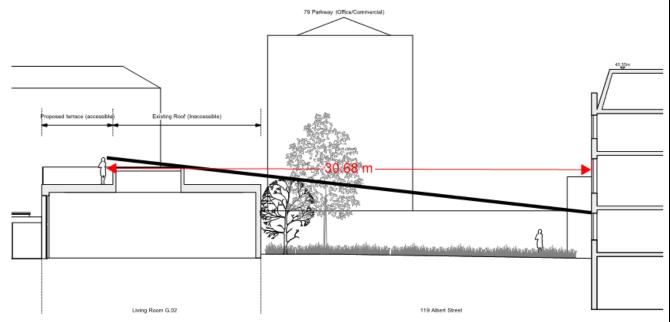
Sightline from proposed roof terrace to rear of Albert Street properties.
